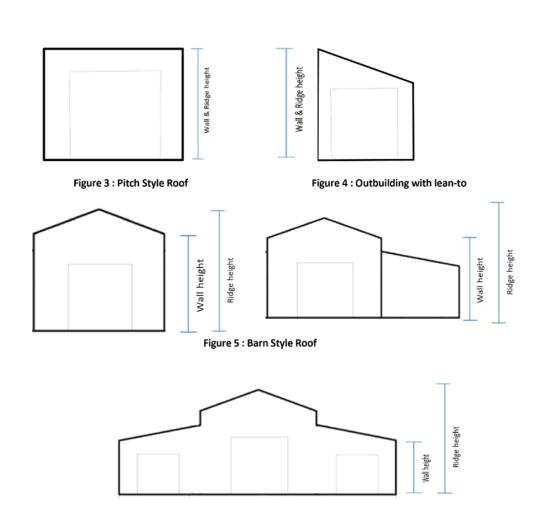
Measuring wall and ridge height of an Outbuilding and/or Non-habitable buildings.
